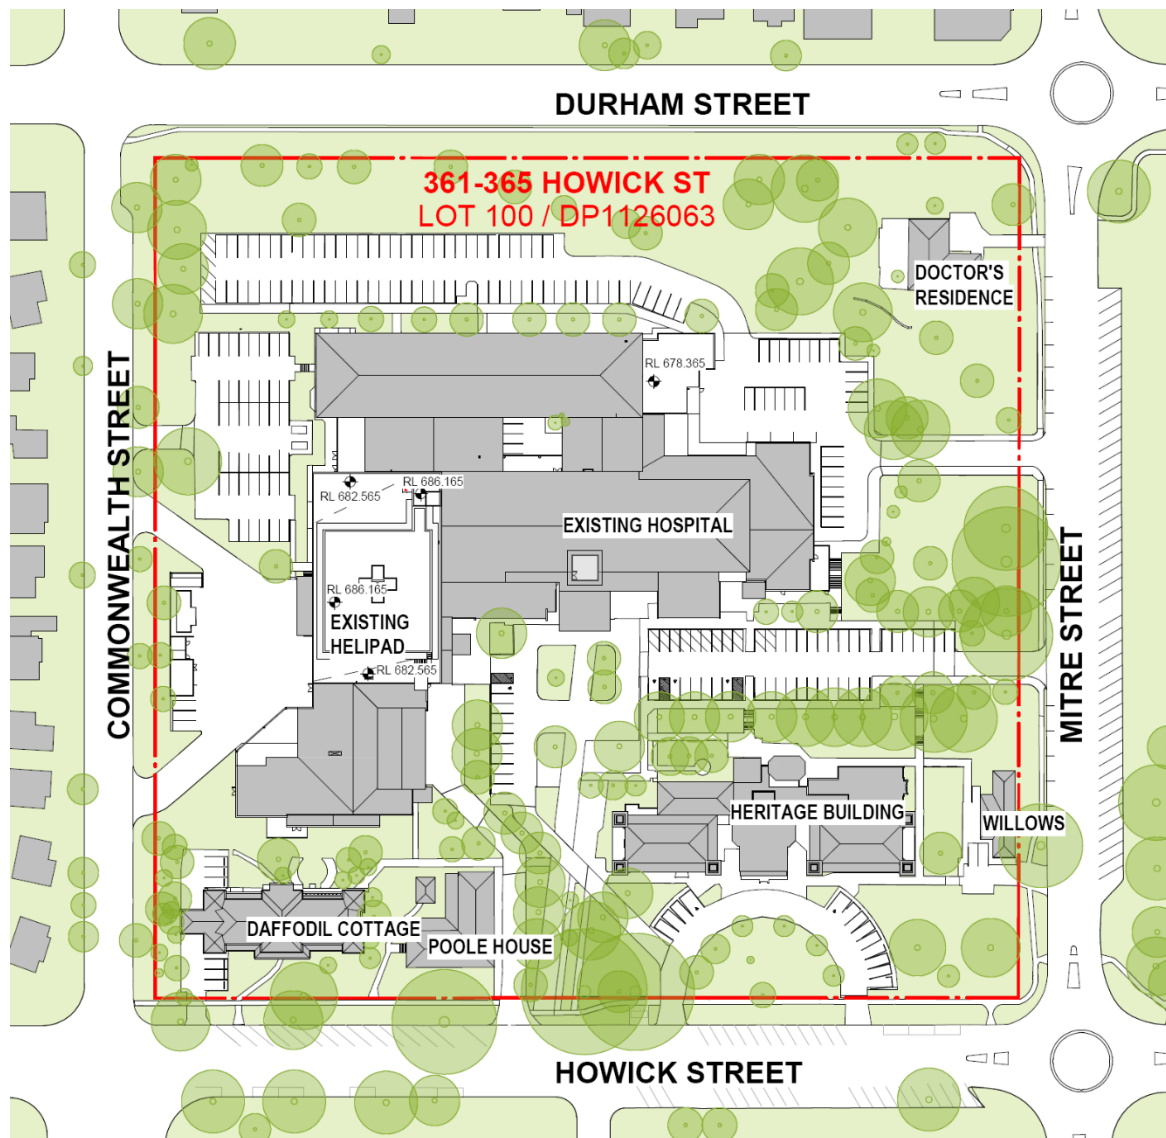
Bathurst Hospital Existing Site Plan (source: BLP BHR-BLP-DRW-ARC-SSD-001-XX001 [C])
